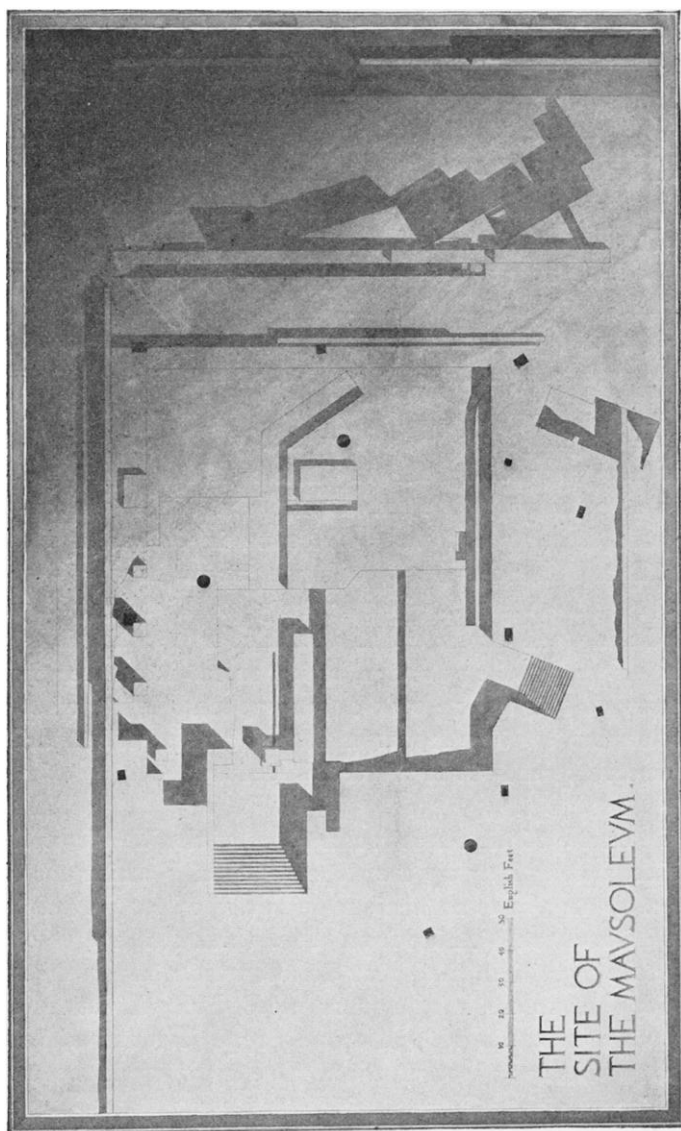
PLAN OF ROCK CUTTINGS FOR FOUNDATIONS, MAUSOLEUM.
